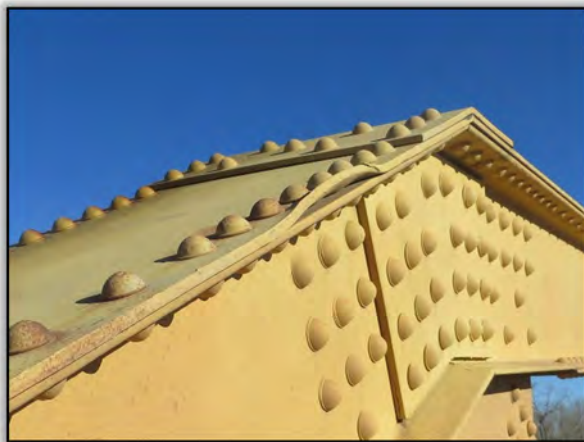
Typical Truss Upper Chord Collision Damage
